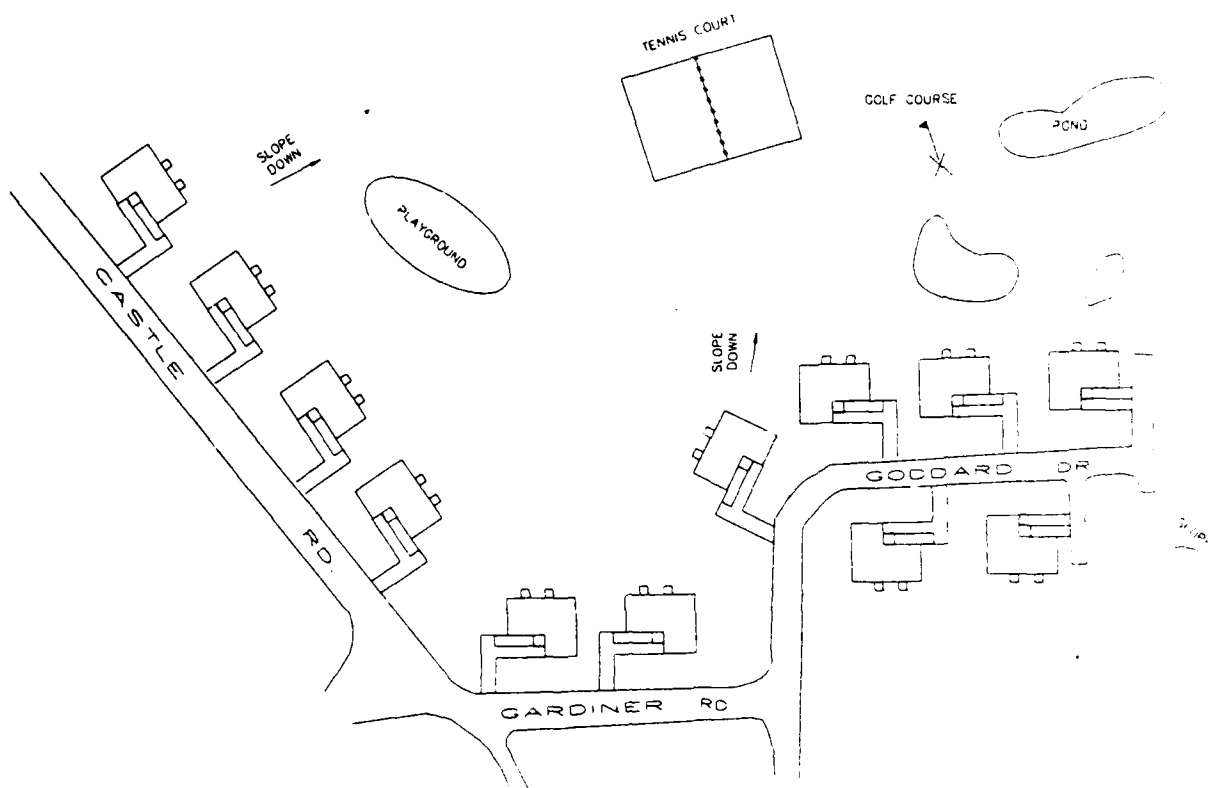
Site Plan Map of Nahant Army Housing Units
